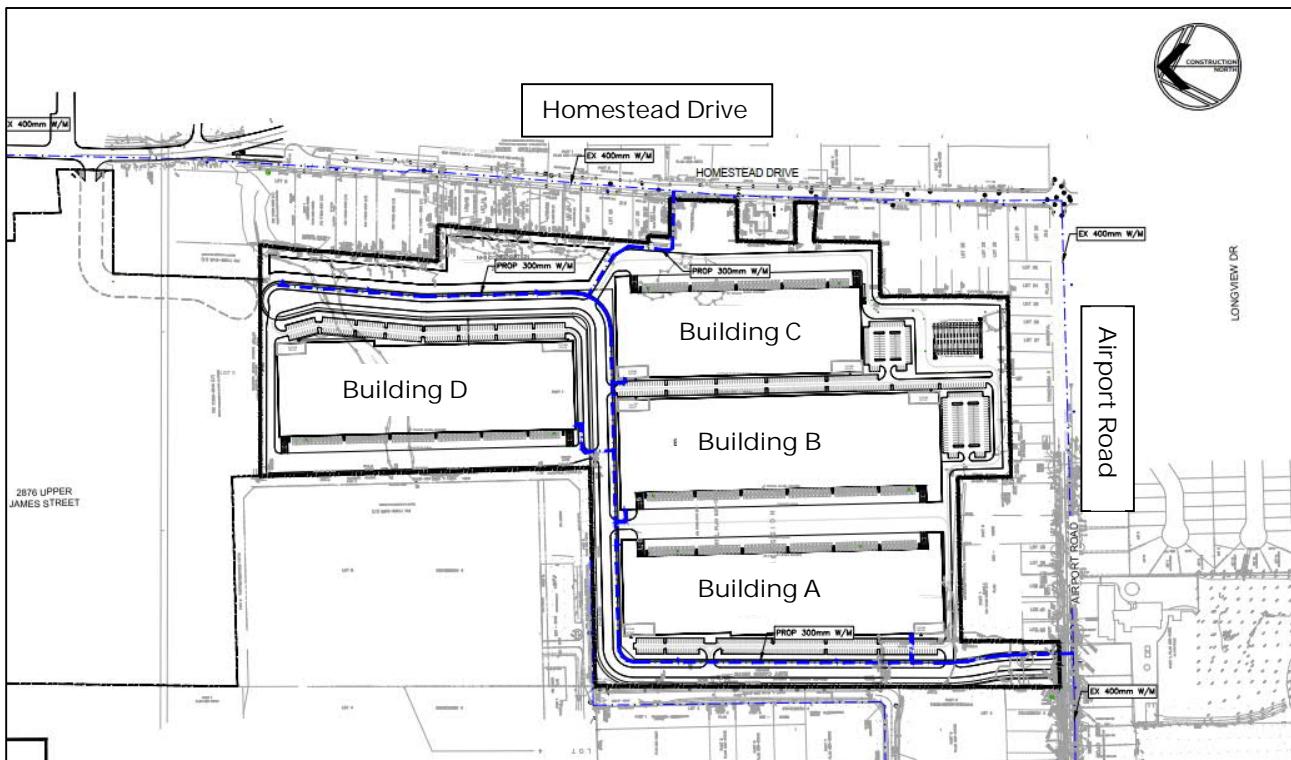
1: The Proposed 3054 Homestead Drive Development Site Plan
